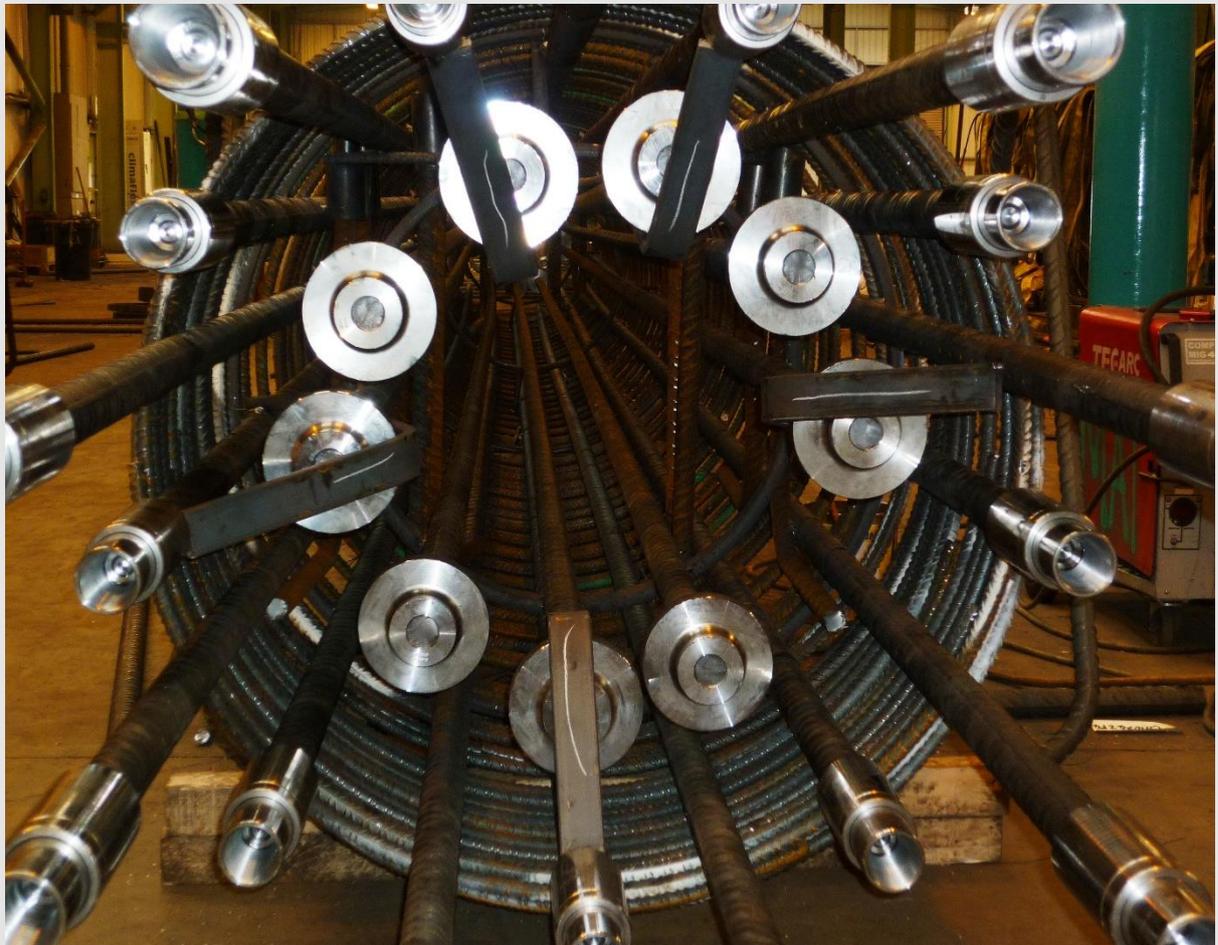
Typical cross section of a typical reinforcement cage for the male piles
